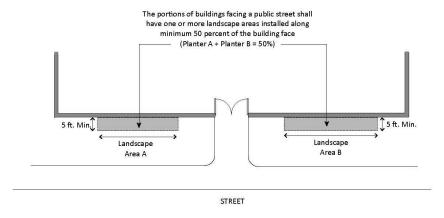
N1.D: BUILDING PERIMETER LANDSCAPING
